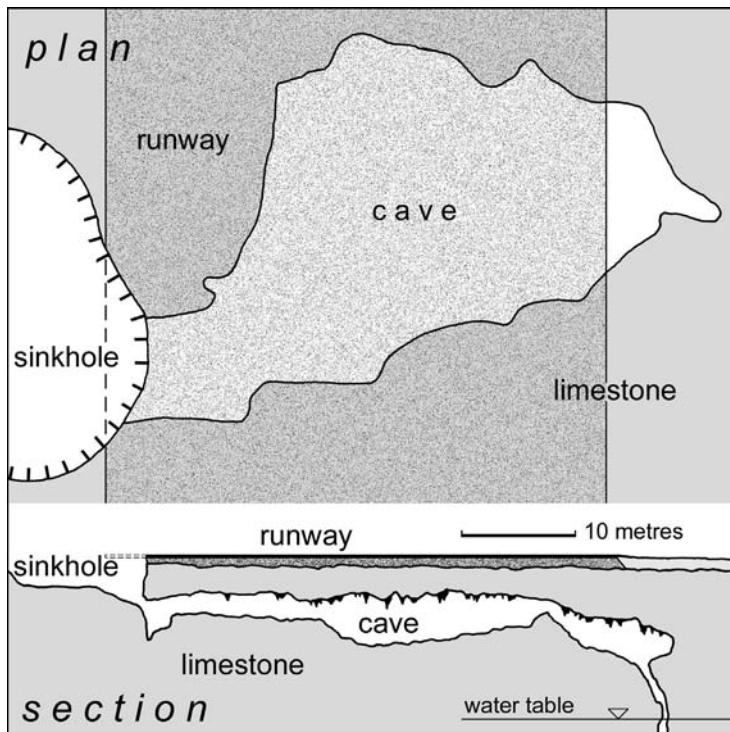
Plan and section of the cave found beneath the runway at Palermo airport in Sicily; on the section, part of the limestone immediately beneath the main cave and the sinkhole floor is a layer of breakdown blocks of unknown depth.
